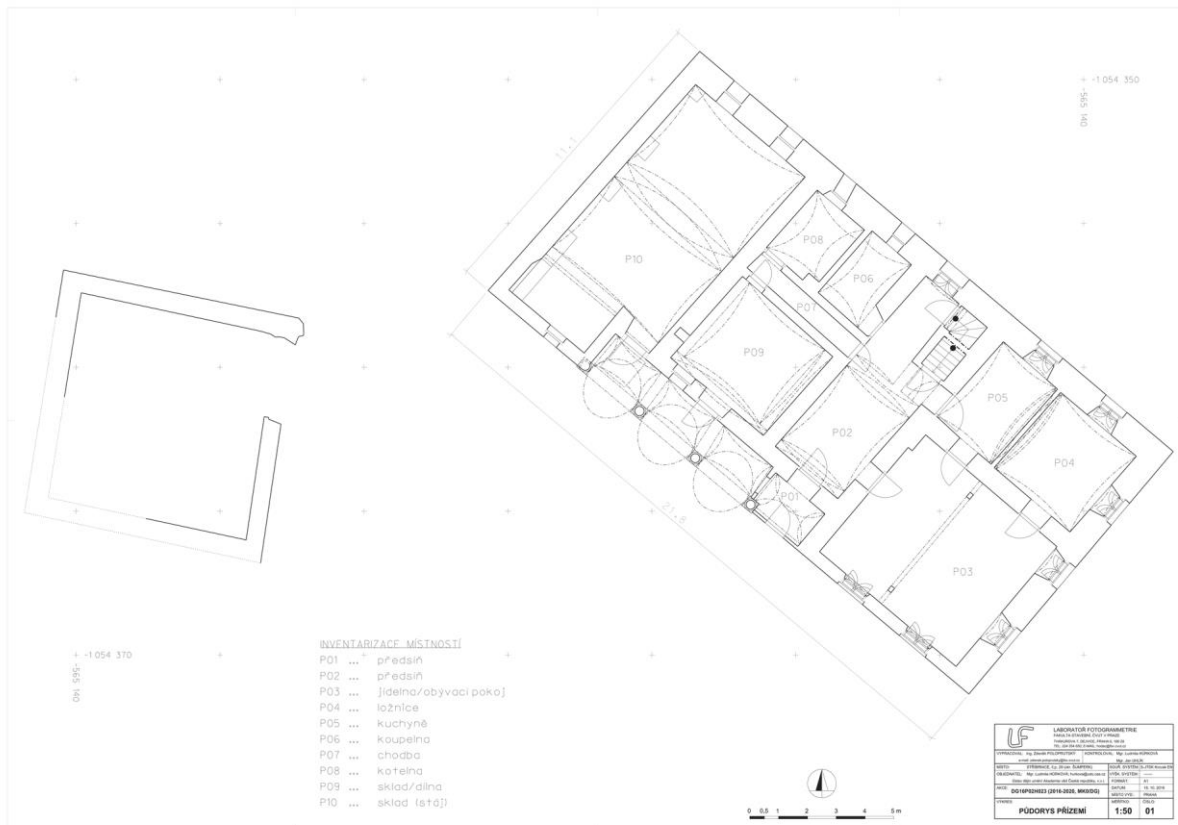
Example of the ground plan of a ground-floor, Stříbrnice (Šumperk District, Czech Republic)
